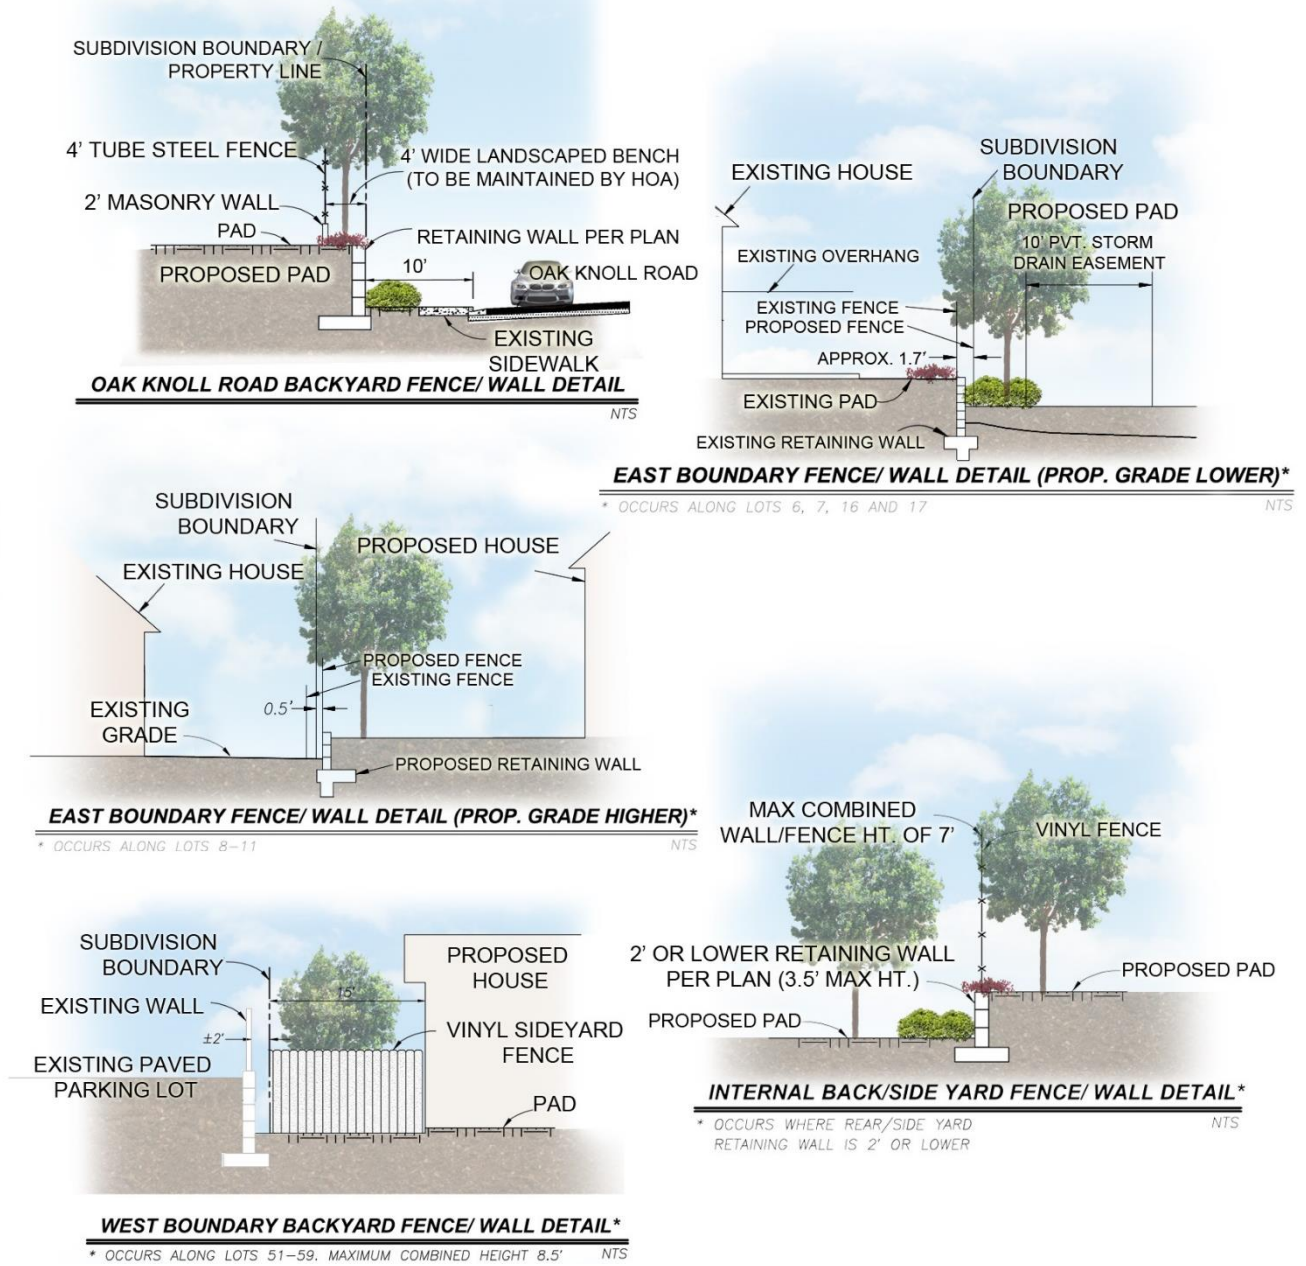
Conceptual Retaining Wall & Fence Design
